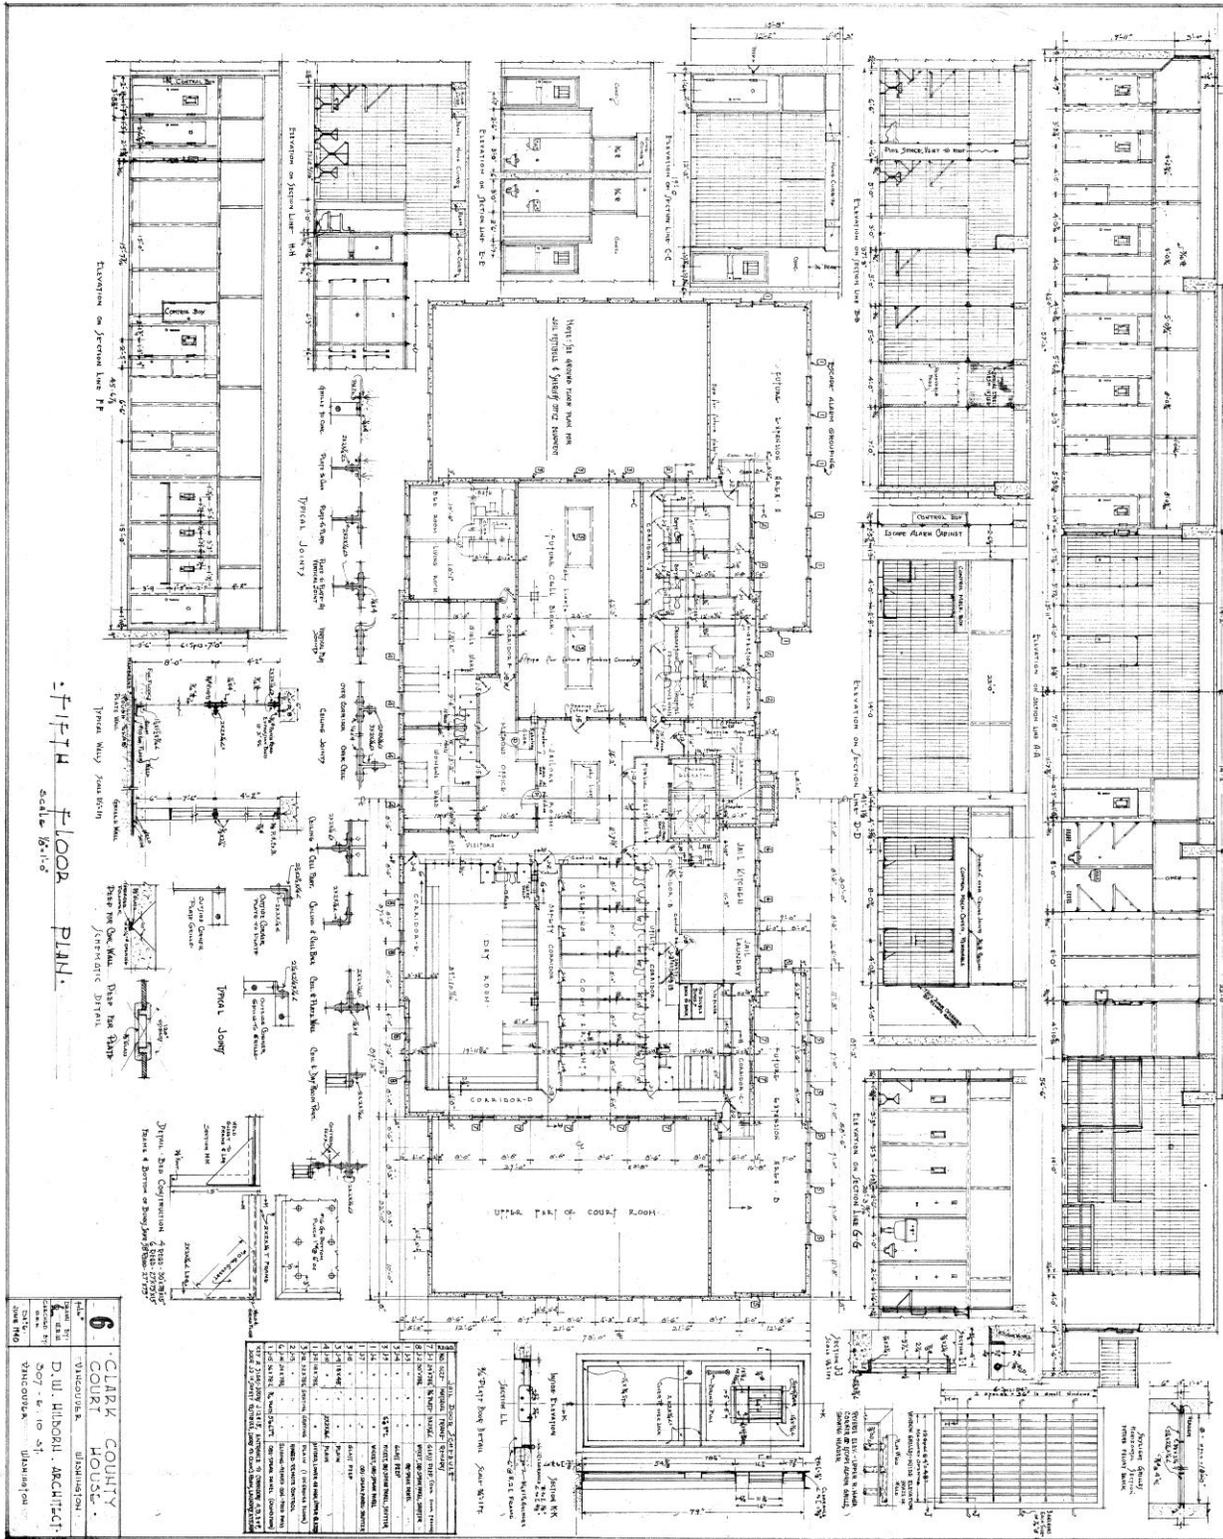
Courthouse Floor Plan Drawing – Fifth Floor & Jail details
